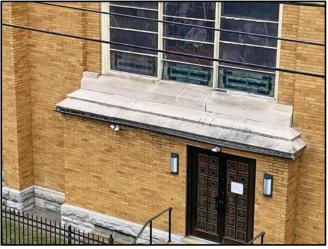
Water staining and early cracking at cast stone stringcourse above north entrance. Movement in cast stone elements beginning to crack brick dentils.
